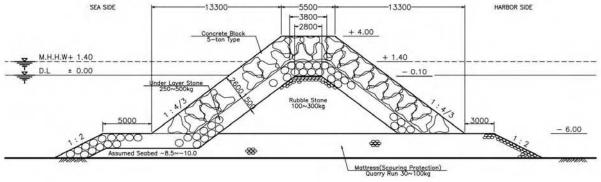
Typical Cross Section of the Breakwater at Tg. Bulupandan
